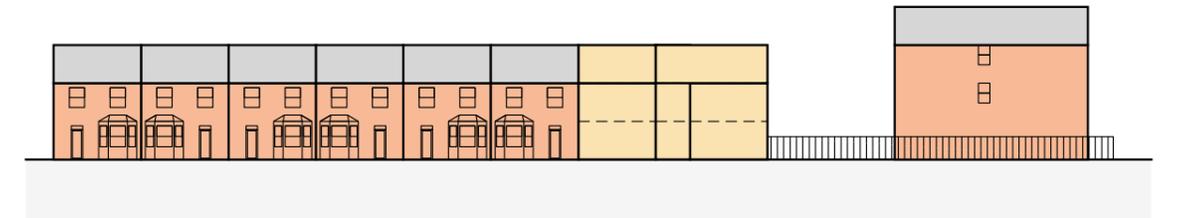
New street extensions should maintain the prevailing building height of its neighbours, taking into account the fact that pitched roofs can generally be counted as a floor.
